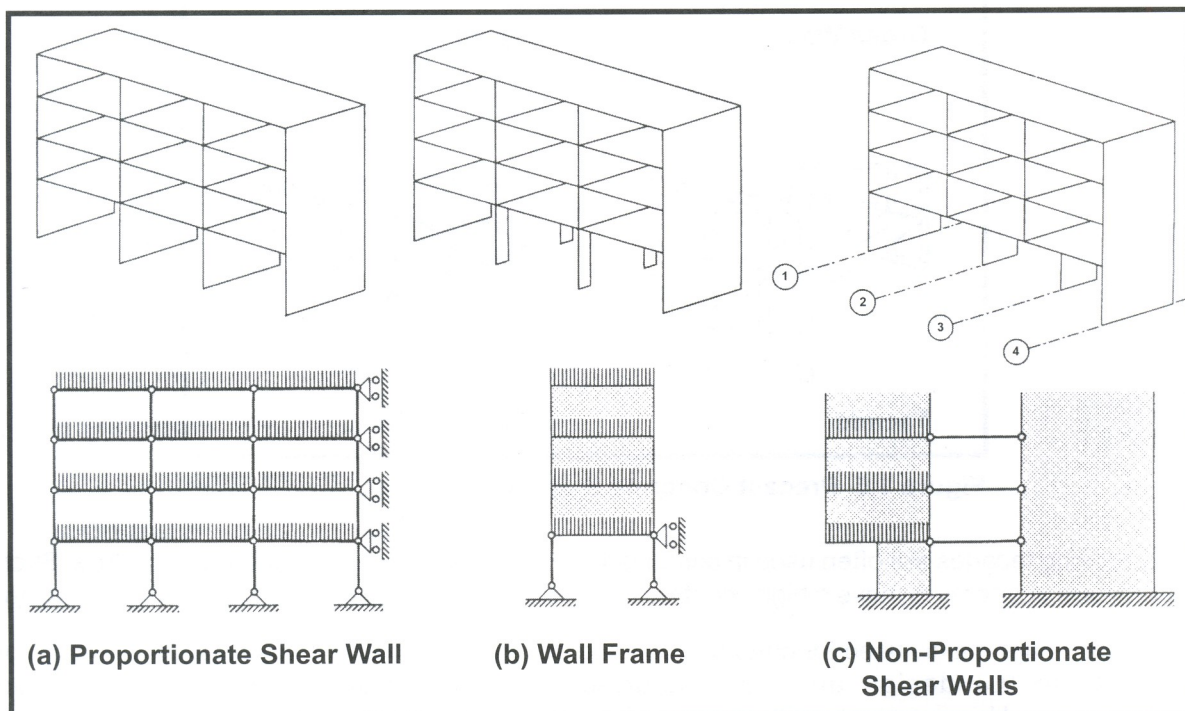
Statical Models For Vertical And Horizontal Load Distribution Of Large Panel Structures
